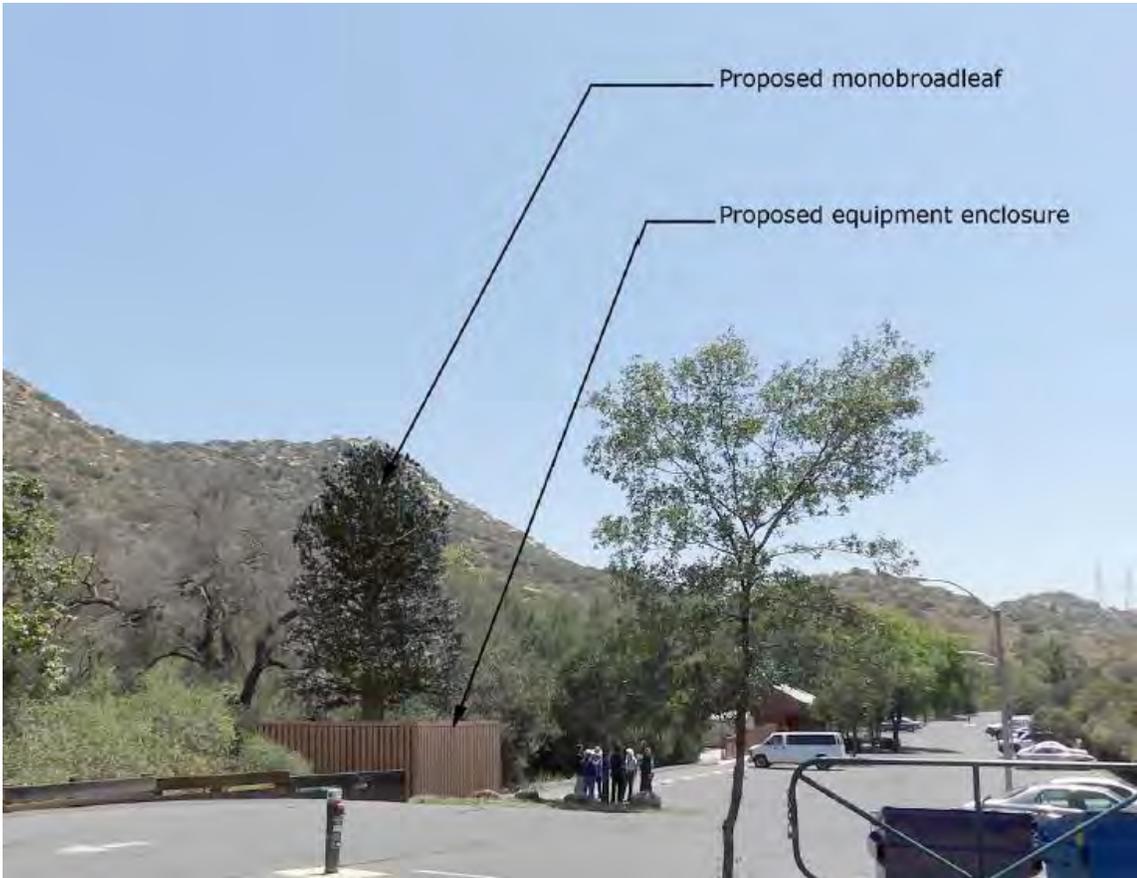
Proposed 35-foot mono-broadleaf tree and 8-foot cedarcrete equipment enclosure.
